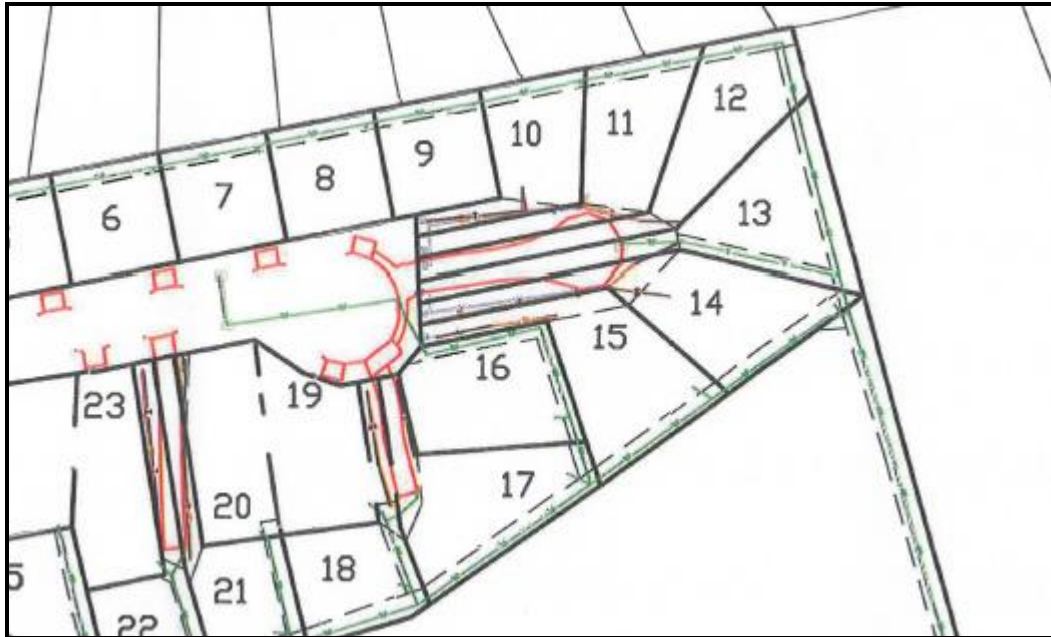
A snapshot of the 'as-constructed' drawing showing the private road formed as a cul-de sac head.
